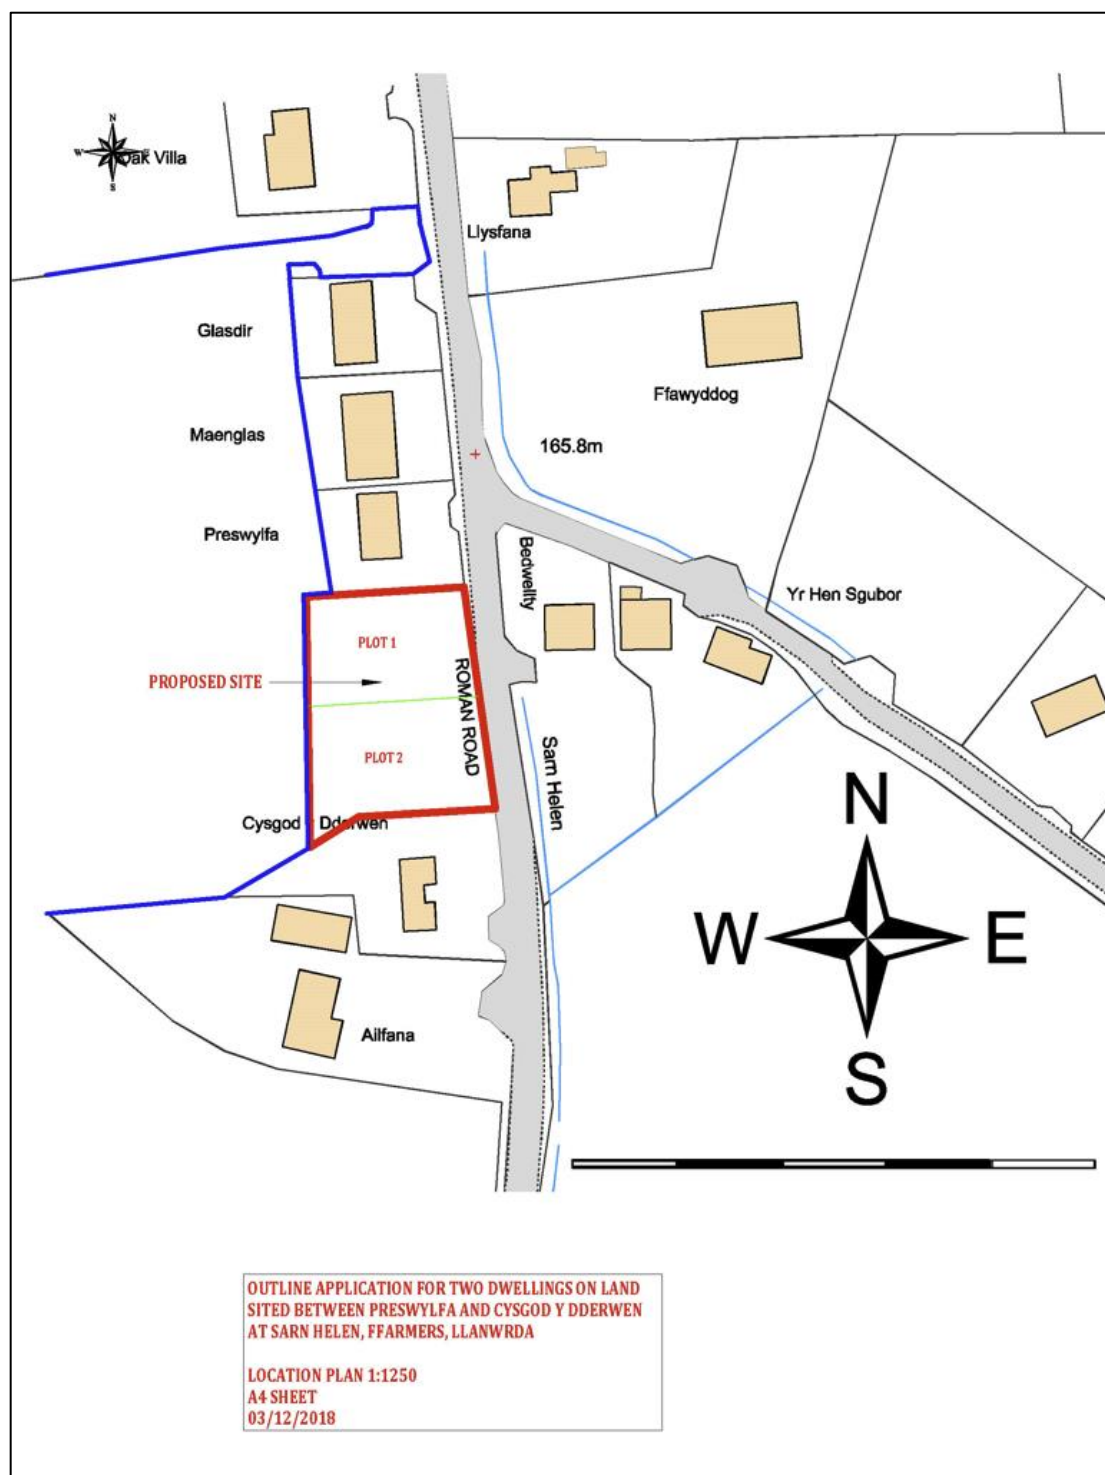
Detailed location plan showing the development site outlined in red and the Roman road (Sarn Helen). Plan supplied by the client.
